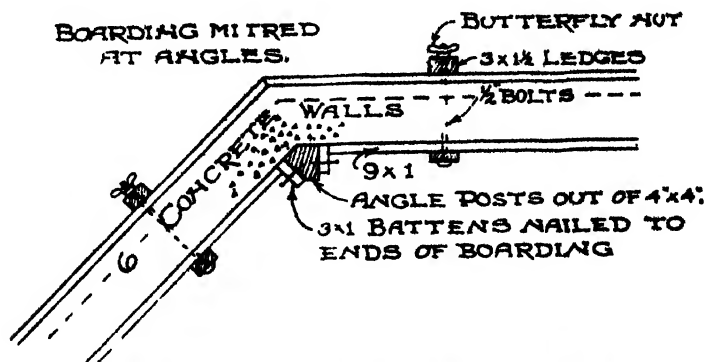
Detail Plan of Corner of Octagonal Concrete Silo, showing Forms.
